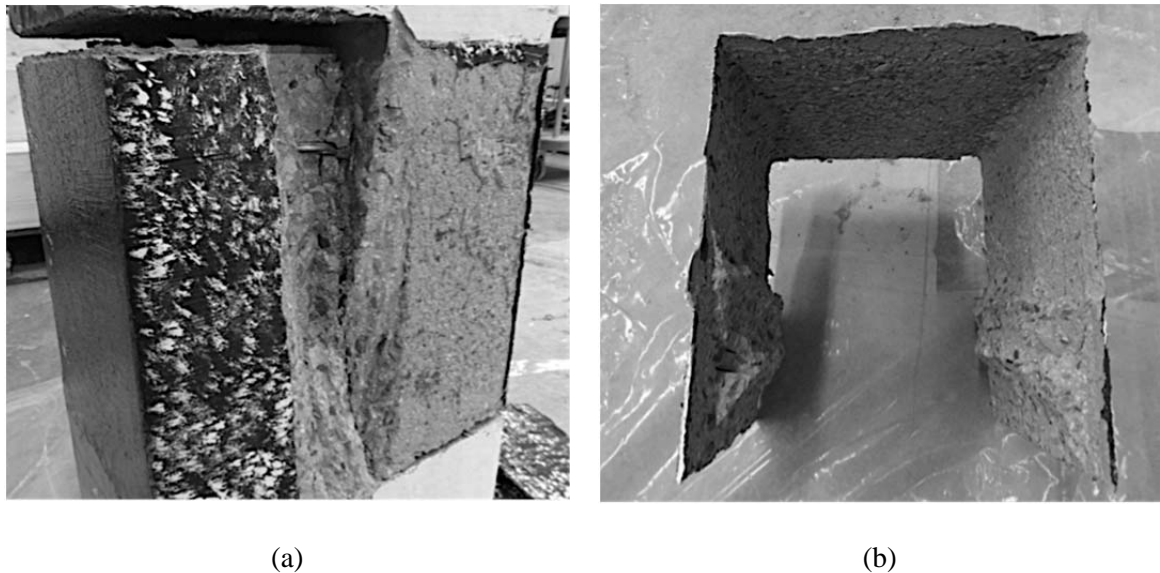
Failure modes of specimens strengthened with short U-wraps: (a) specimen F1S2, (b) removed U-wrap from specimen F2S2.
